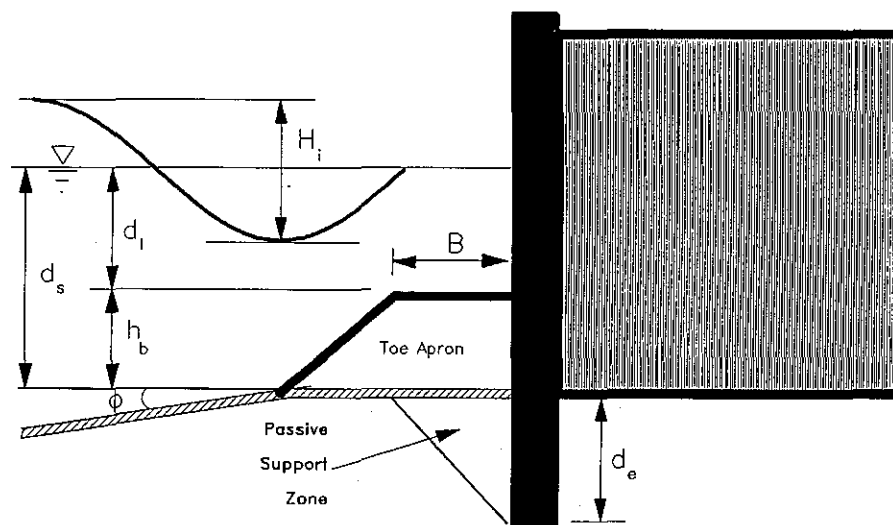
Typical Toe Apron for Sheet-Pile Walls
